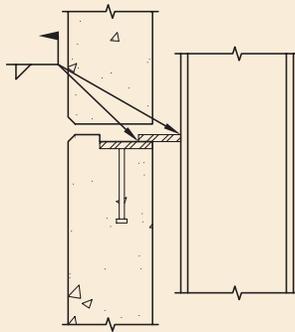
Welded tieback (WTB5).
